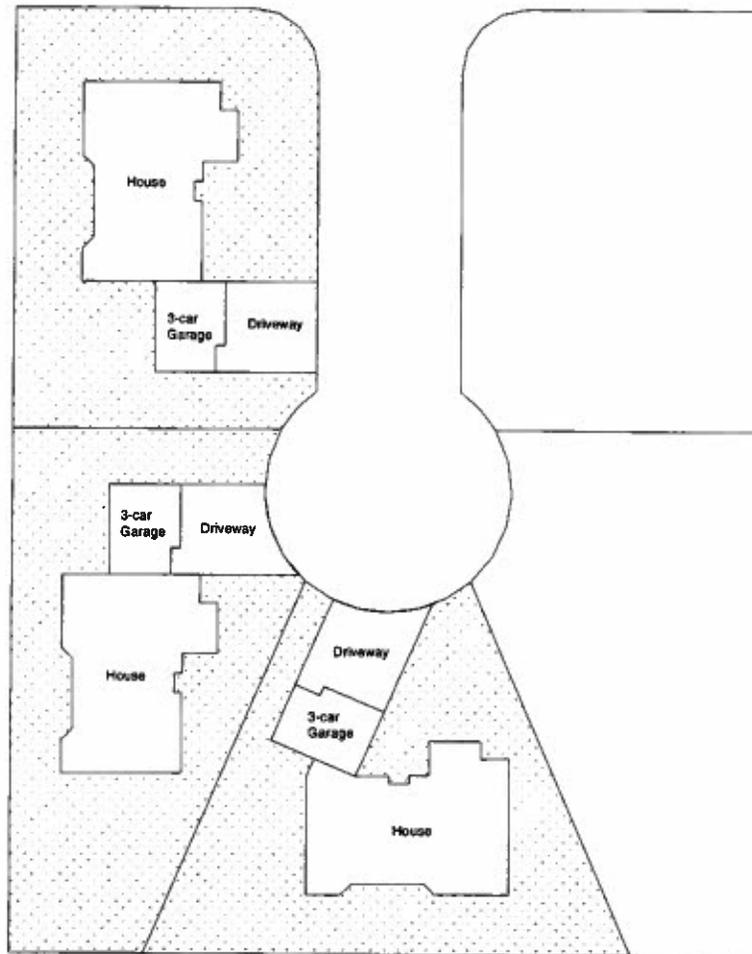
Santa Ana Subdivision PUD Typical Lot Layout—2,450 sq ft Houses With 3-car Garages Shown
